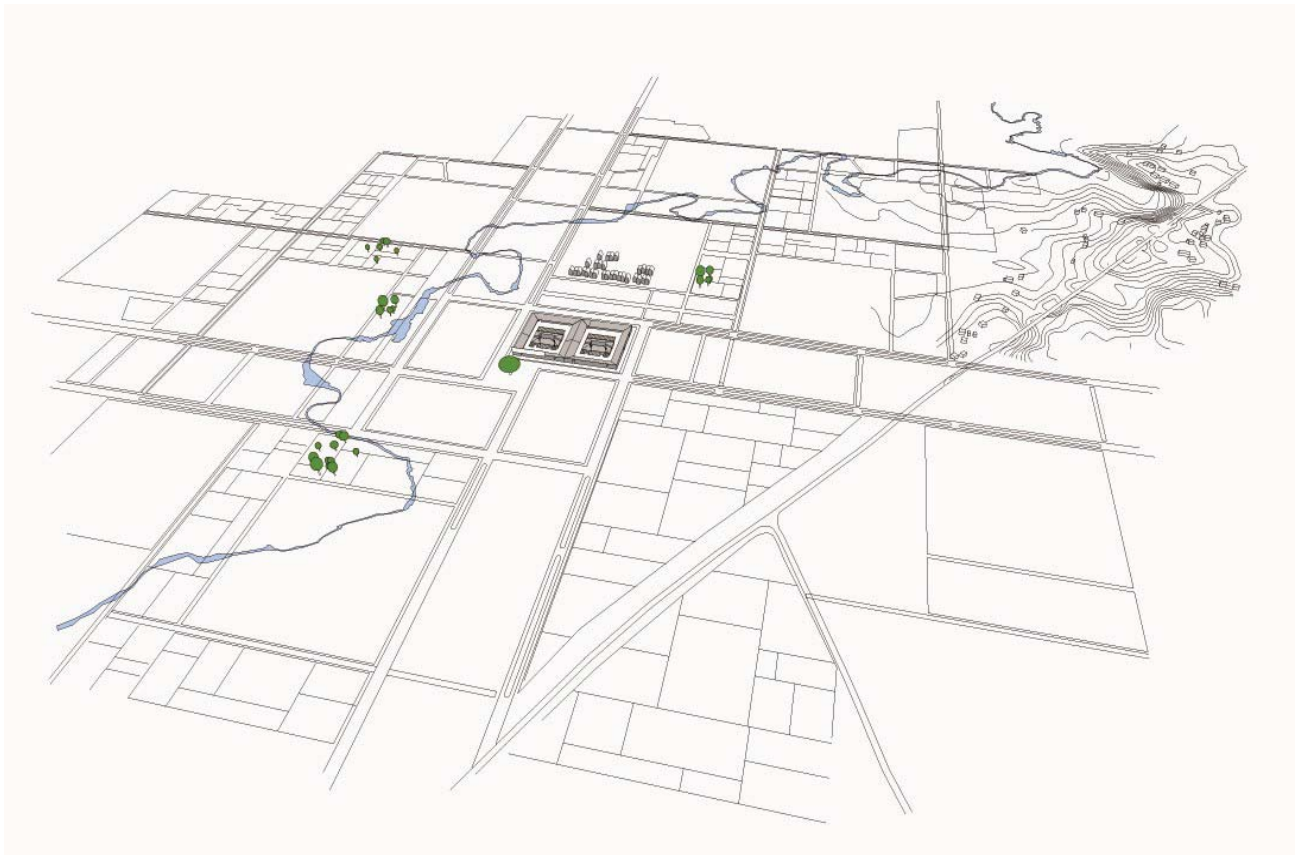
BURANEST town plan - NESTOWN model adapted to real site
